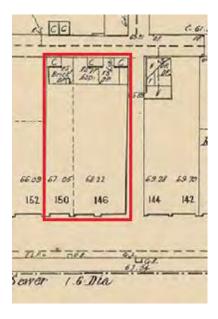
Extract from 1895 MMBW detail plan. (Source: MMBW 1895, SLV)
